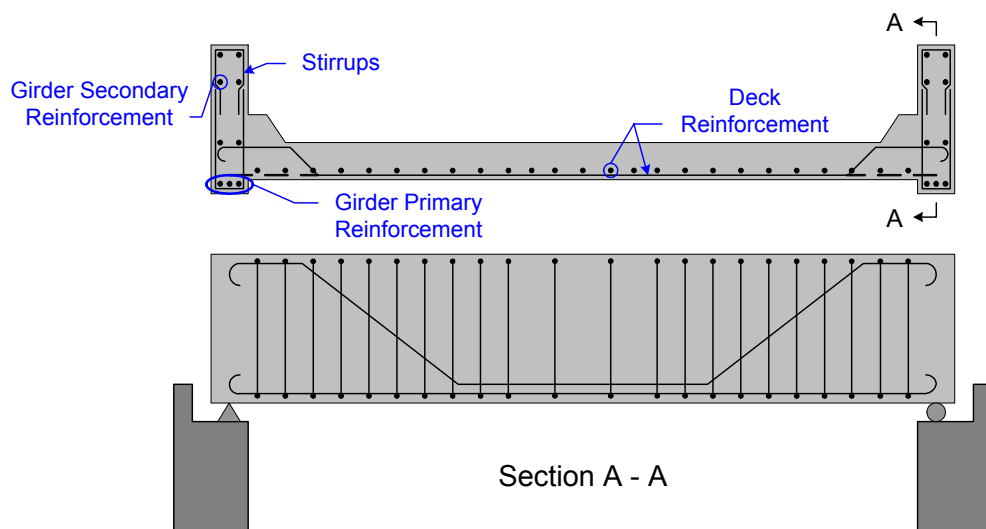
Steel Reinforcement in a Concrete Through Girder
